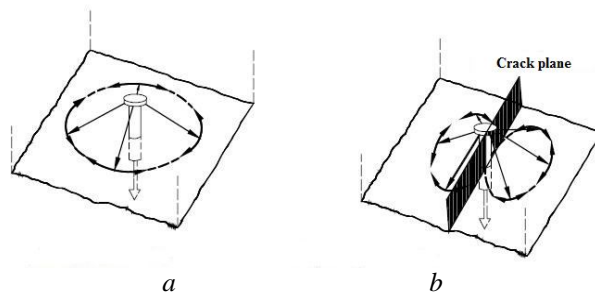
Schematic representation of the force transfer to the concrete: *a* – for non-cracked concrete and *b* – for cracked concrete (Eligehausen, Fuchs and Mayer 1987, 1988).
